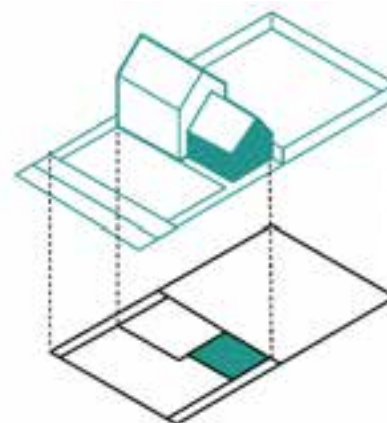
An acceptable example of a side extension which is single storey and set back from the main building line, with a roof form that responds to the original building.
